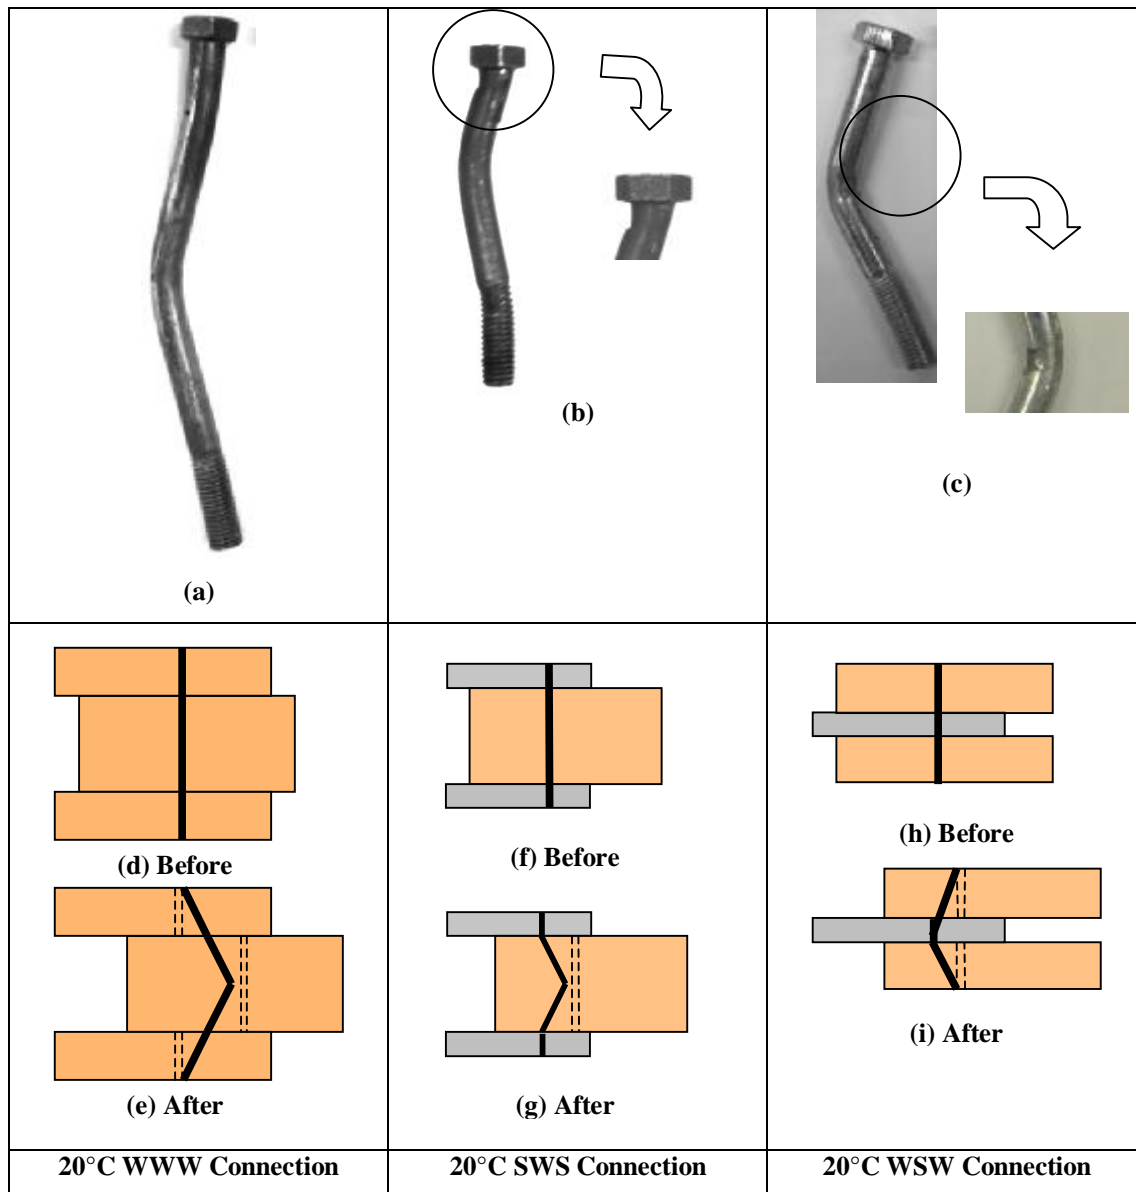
Deformed fasteners at ambient conditions for WSW, SWS and WSW connections.
